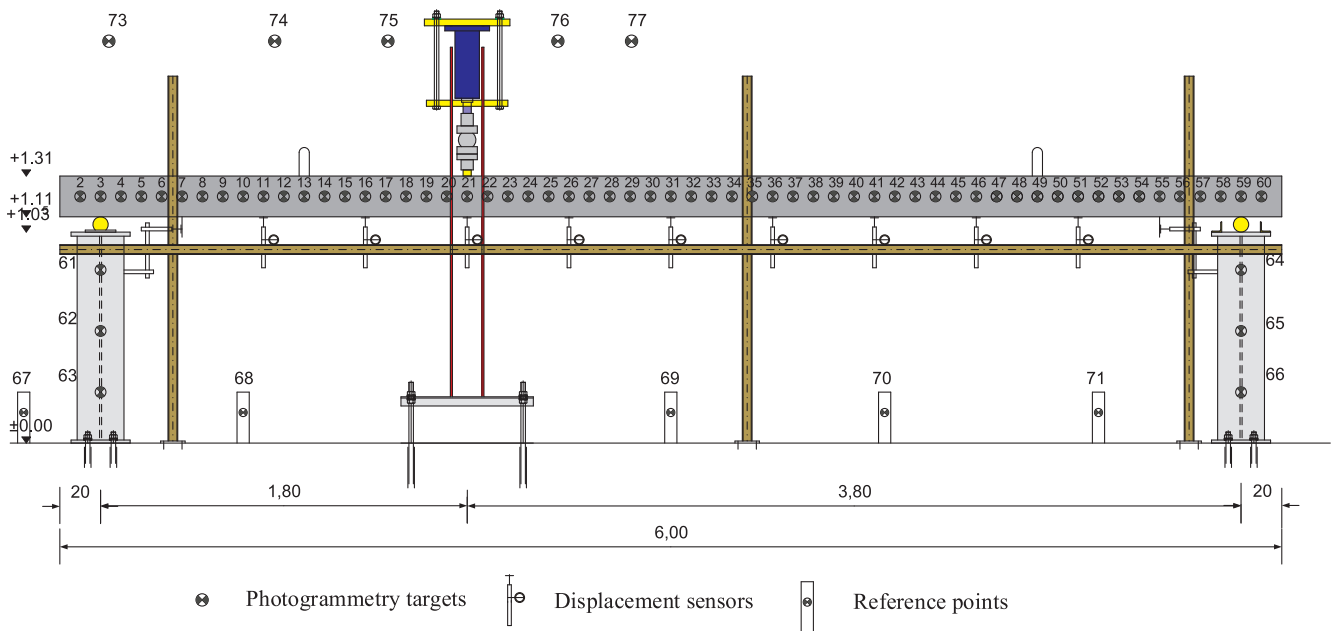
Setup of the laboratory experiment with a reinforced concrete beam [38]
